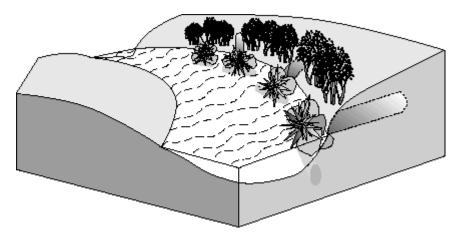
Bank bioengineering technique with large wood jam installed in streambank (Source – NRCS FOTG)
